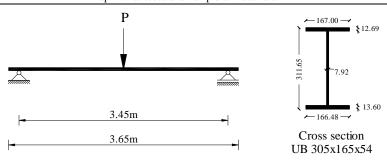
The structural system and the cross section (dimensions of the cross section in mm)
